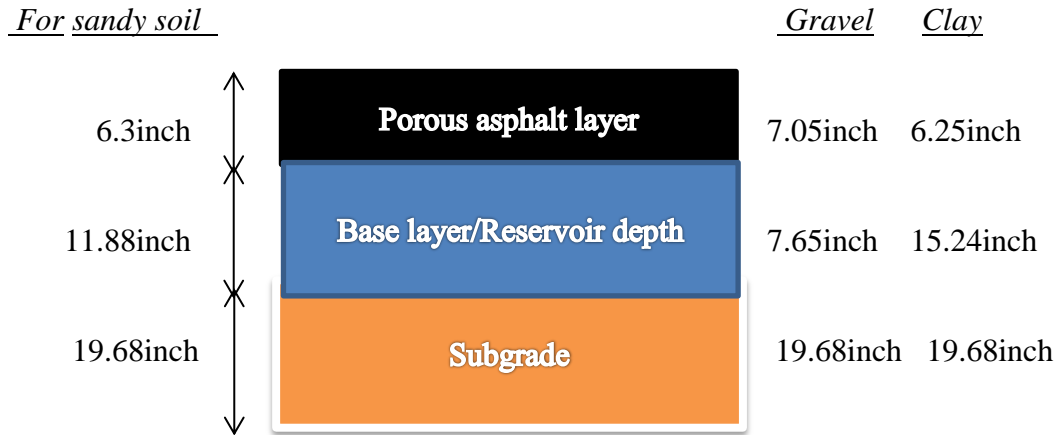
Section of Porous Asphalt Pavement as per Design of 3000000 ESALs
